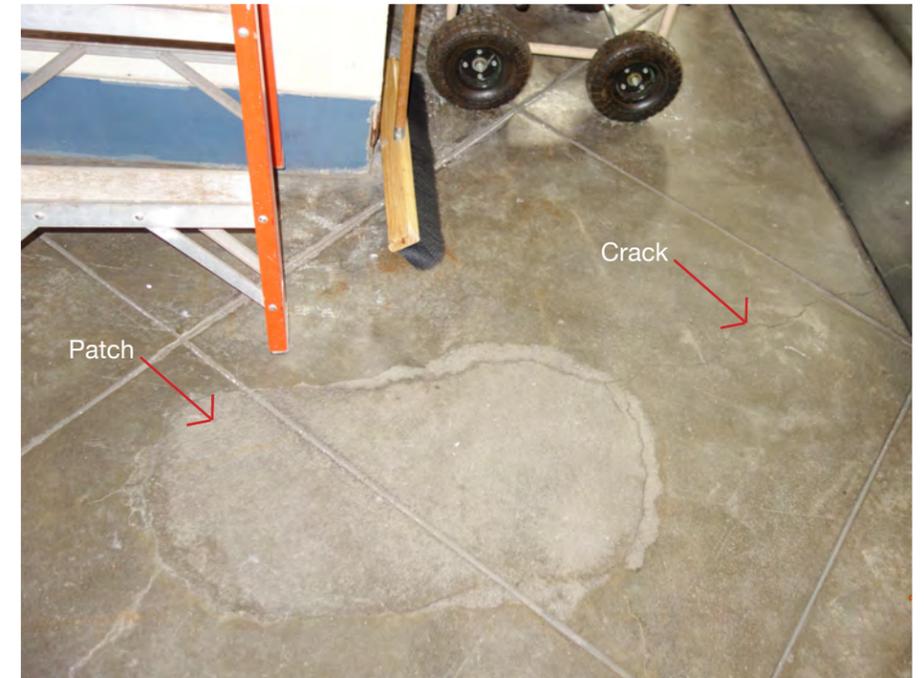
1 Concrete Slab Crack & Patch
